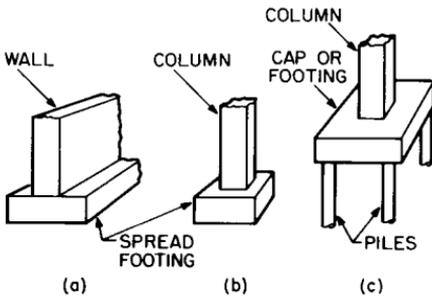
Commonly used foundations: (a) foundation wall on continuous footing; (b) individual spread footing for a column; (c) pile footing for a column.
